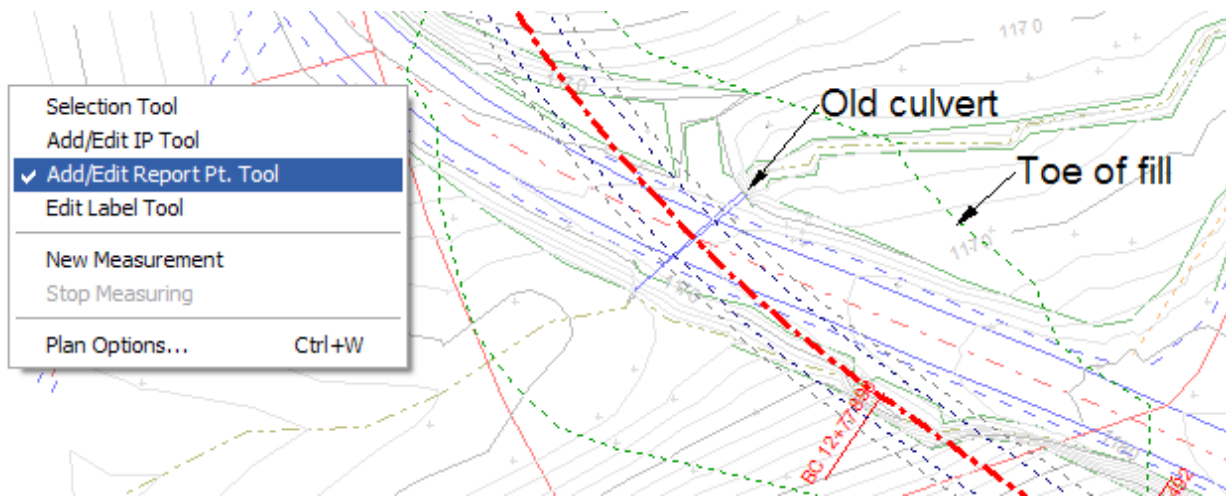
Creek crossing location; you can see the old culvert in the background
